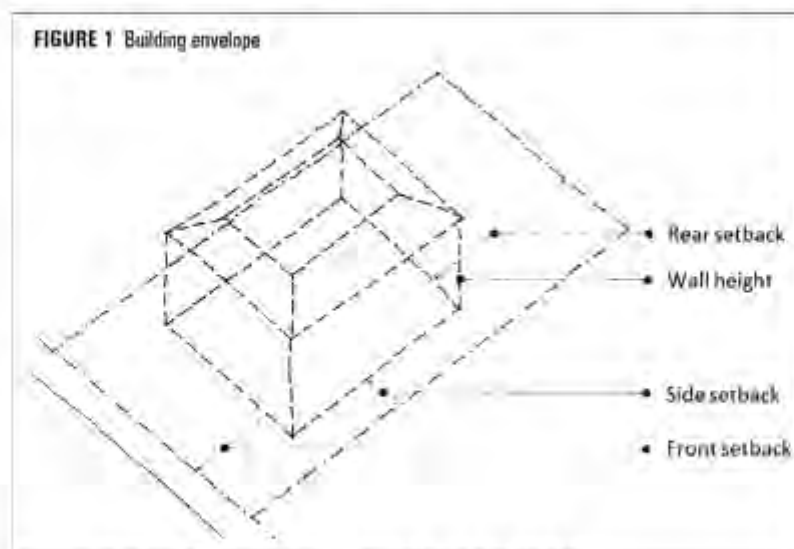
Building Envelope - Extract from Woollahra DCP 2015
